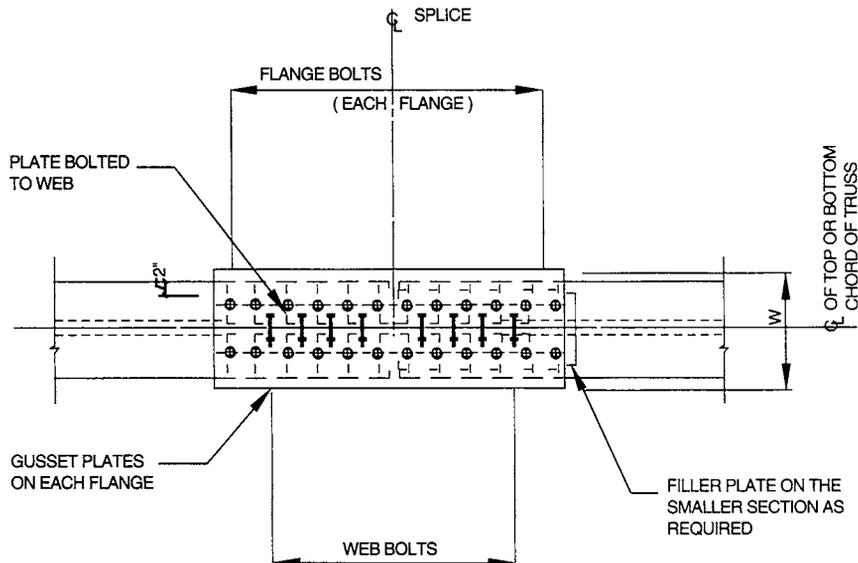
Detail of a splice in the bottom chord of a truss.
